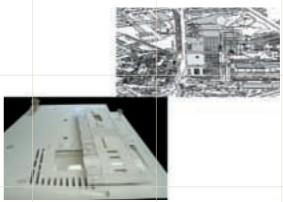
NEW STATE HOSPITAL BUILDING STEYR 2001
